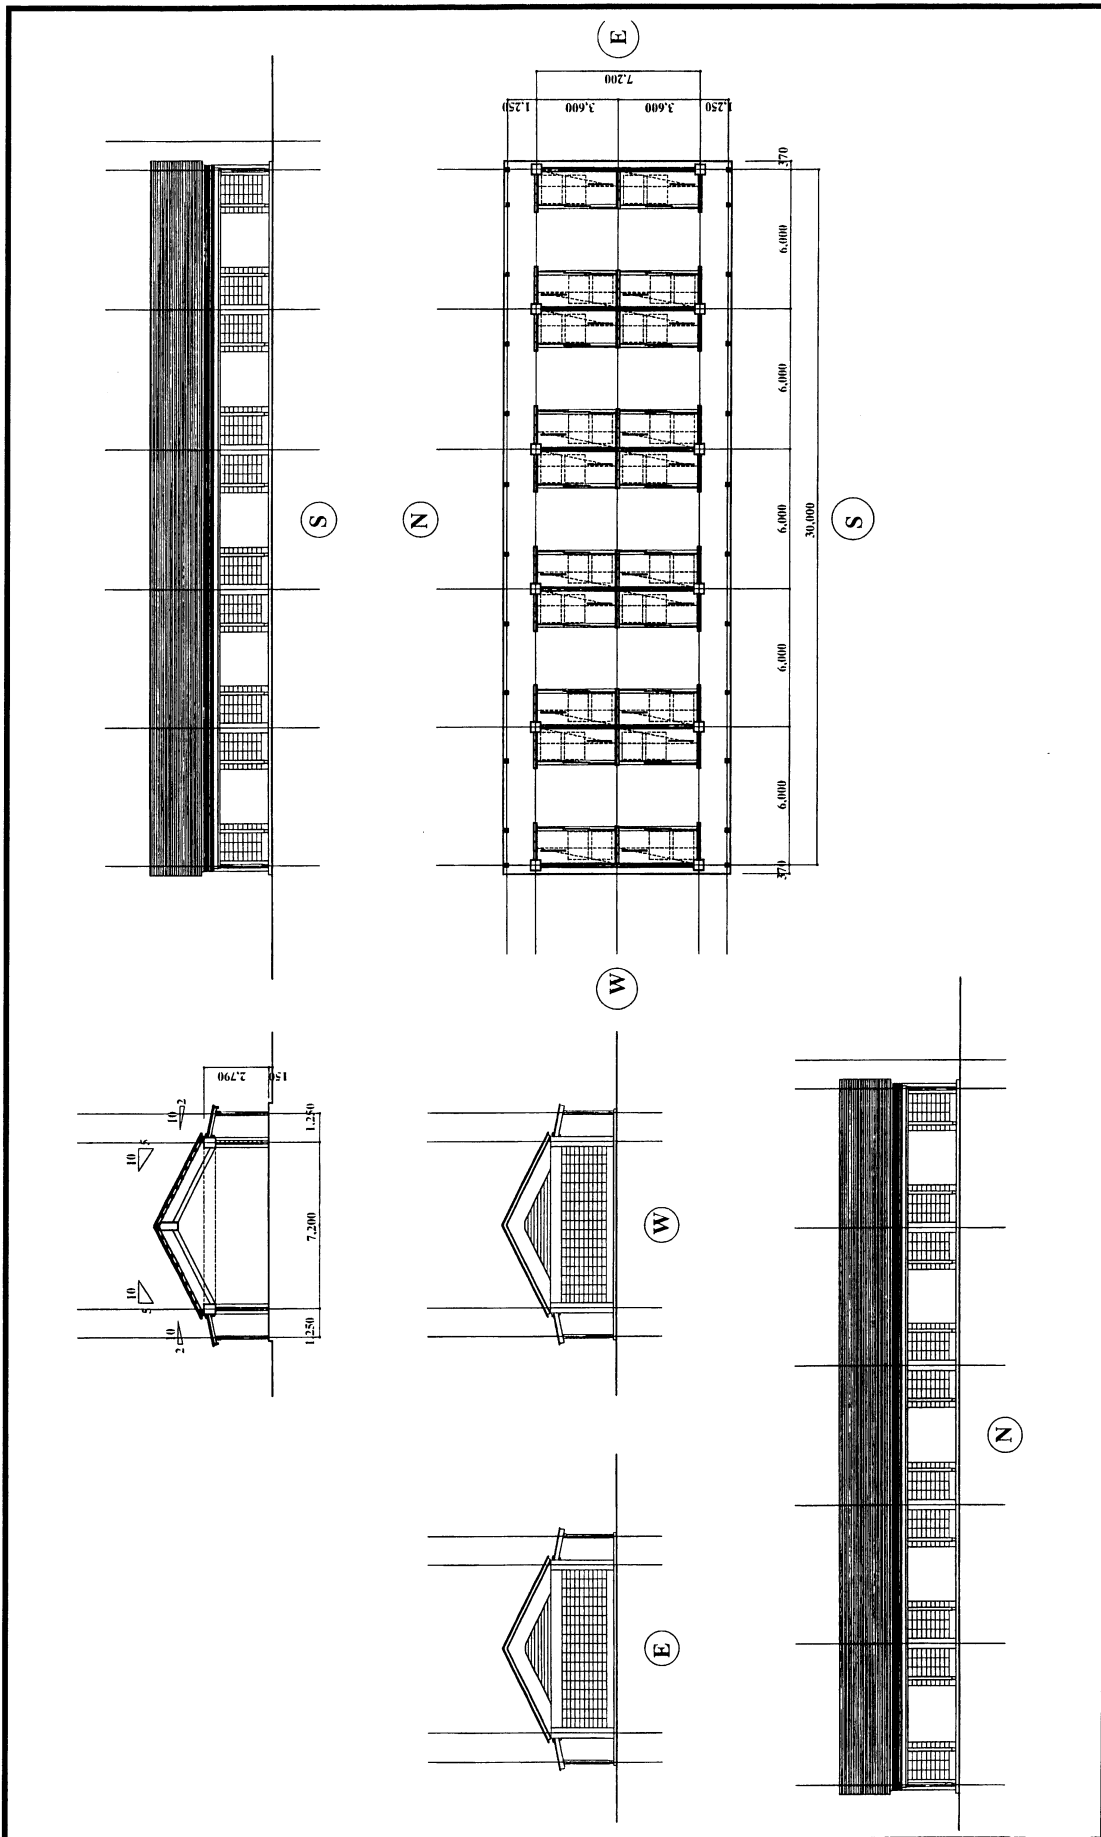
(1) Plan / Section of Gear Locker
